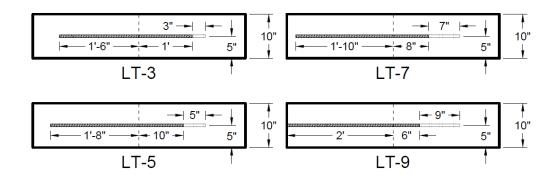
Section Views of the Longitudinal Translation Misalignment Specimens
